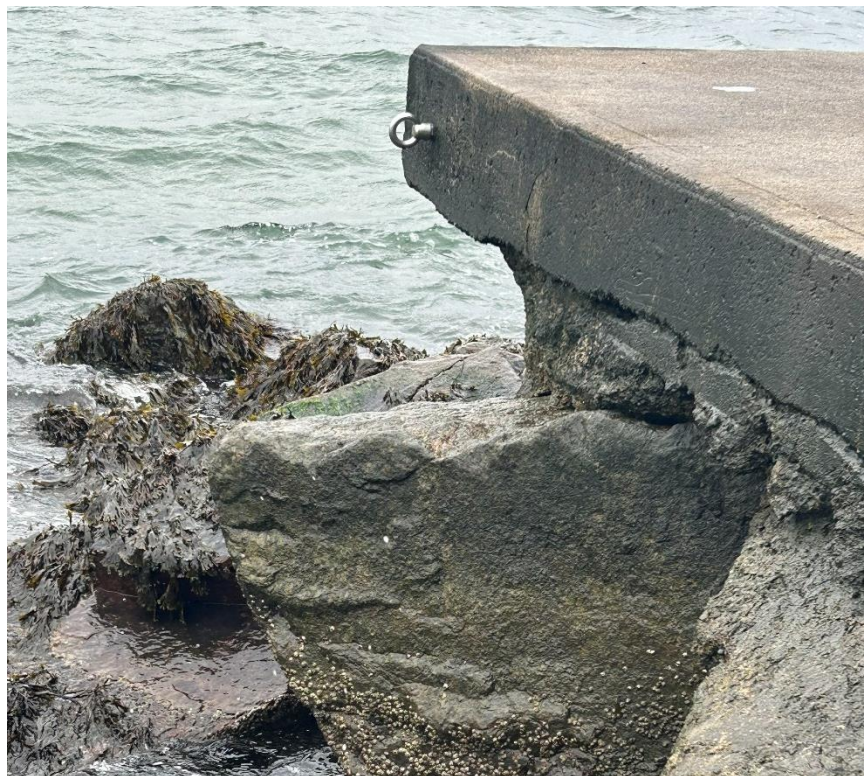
Sea Breeze pier partially cantilevered Northeast corner
